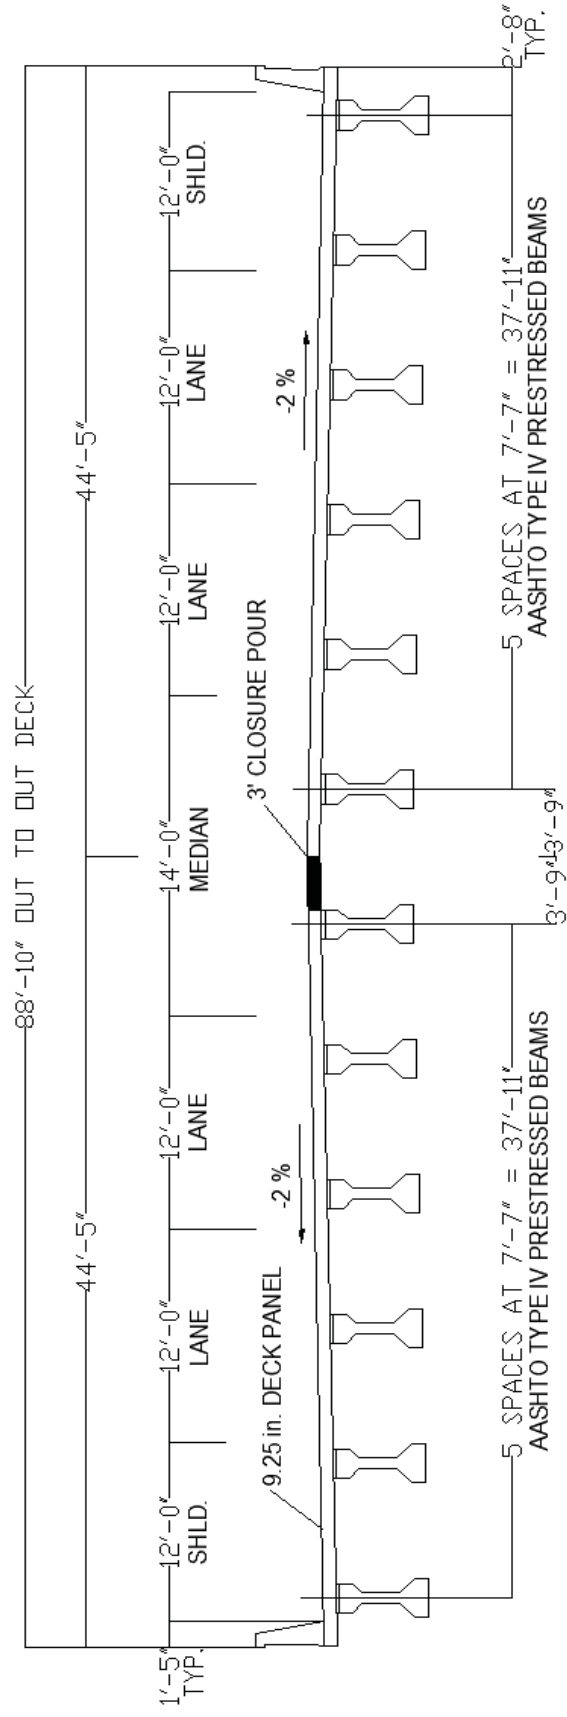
Elevation of Beaver Creek Bridge showing deck and girders
